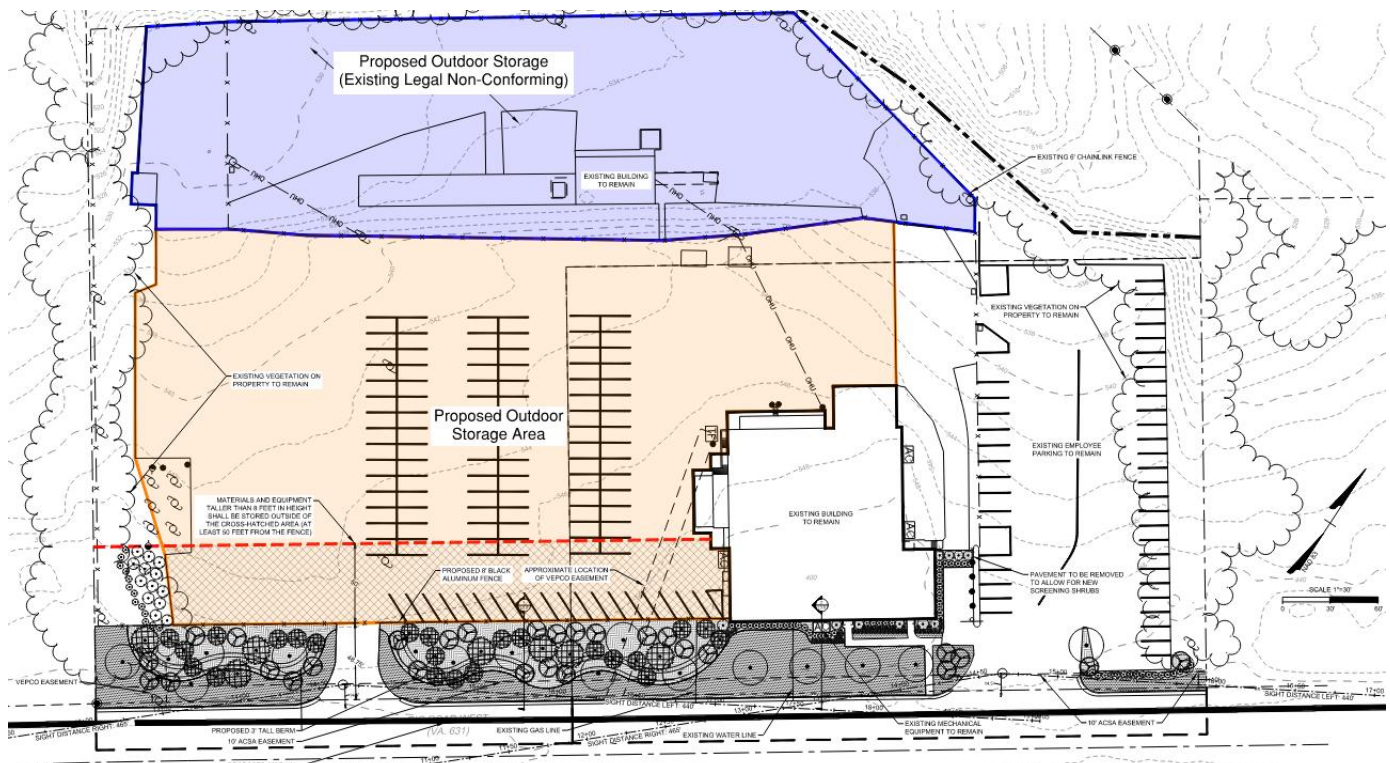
Proposed concept plan with the outdoor storage area shaded in orange. (See attachment 3 for a higher resolution image.)
